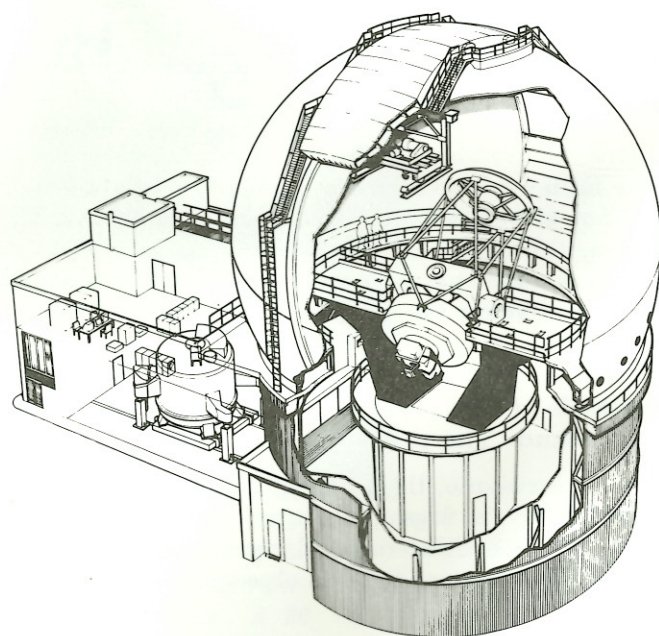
A cutaway drawing to show the design of the William Herschel Telescope
